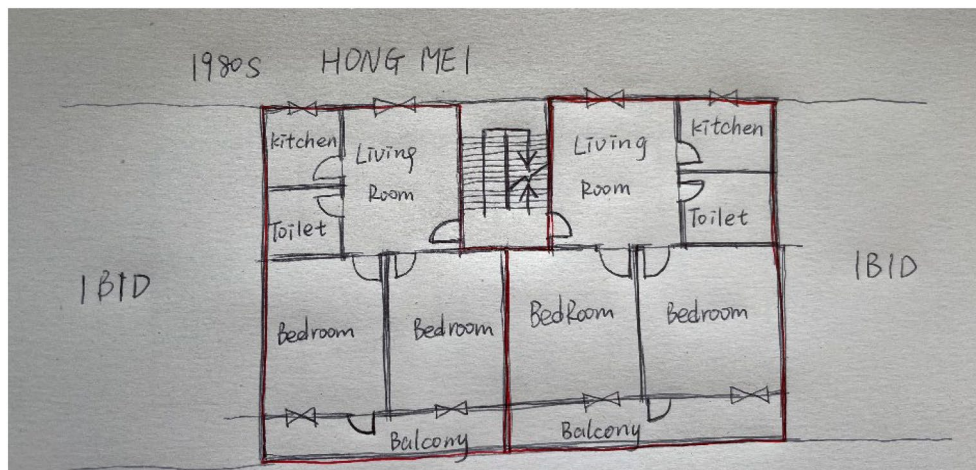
Floor plan. Ling, Yuying. Sketch of Hongmei Village apartment floor plan. June 10, 2023
